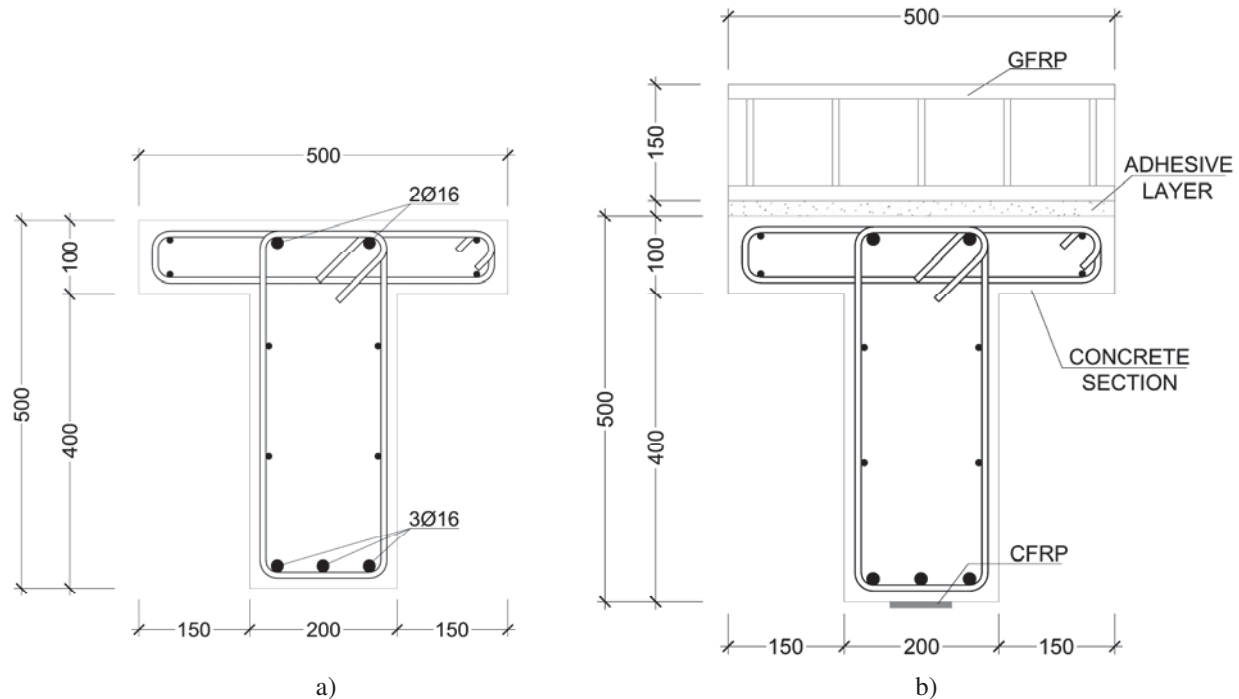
Prototype reinforced concrete beam: a) un-strengthened; b) strengthened.
